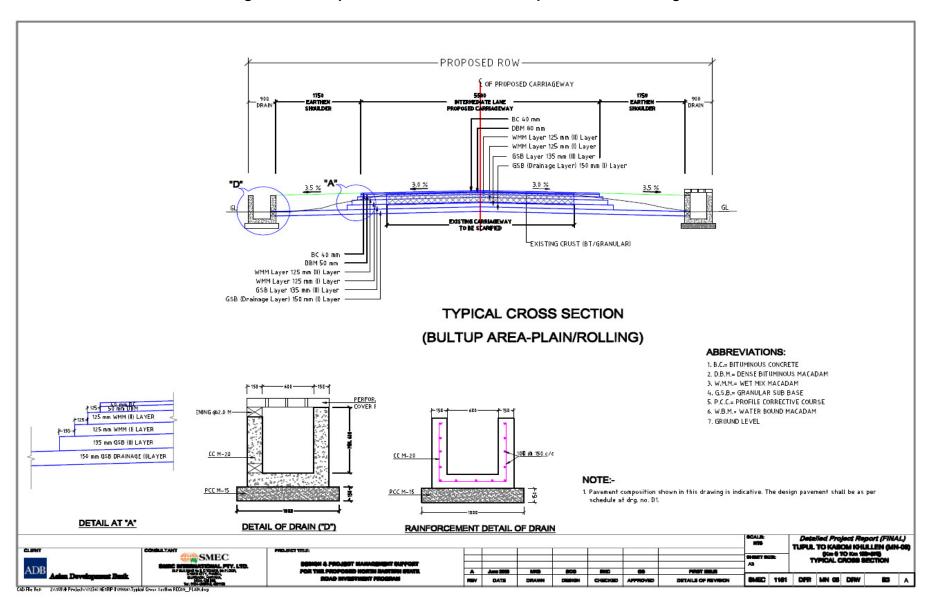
Proposed cross section in built-up Area – Plain/Rolling
